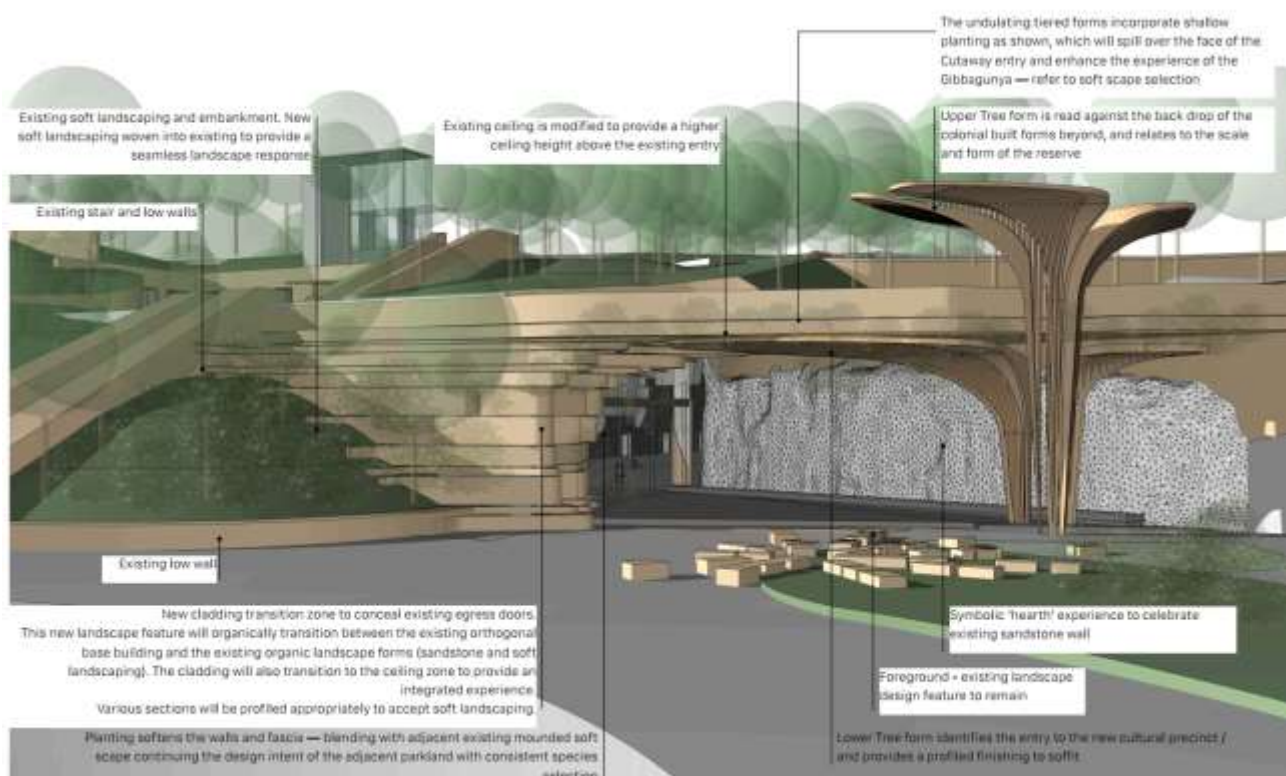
View of proposed landscaping treatment to entry of the Cutaway Cultural Facility, looking east from Nawi Cove
